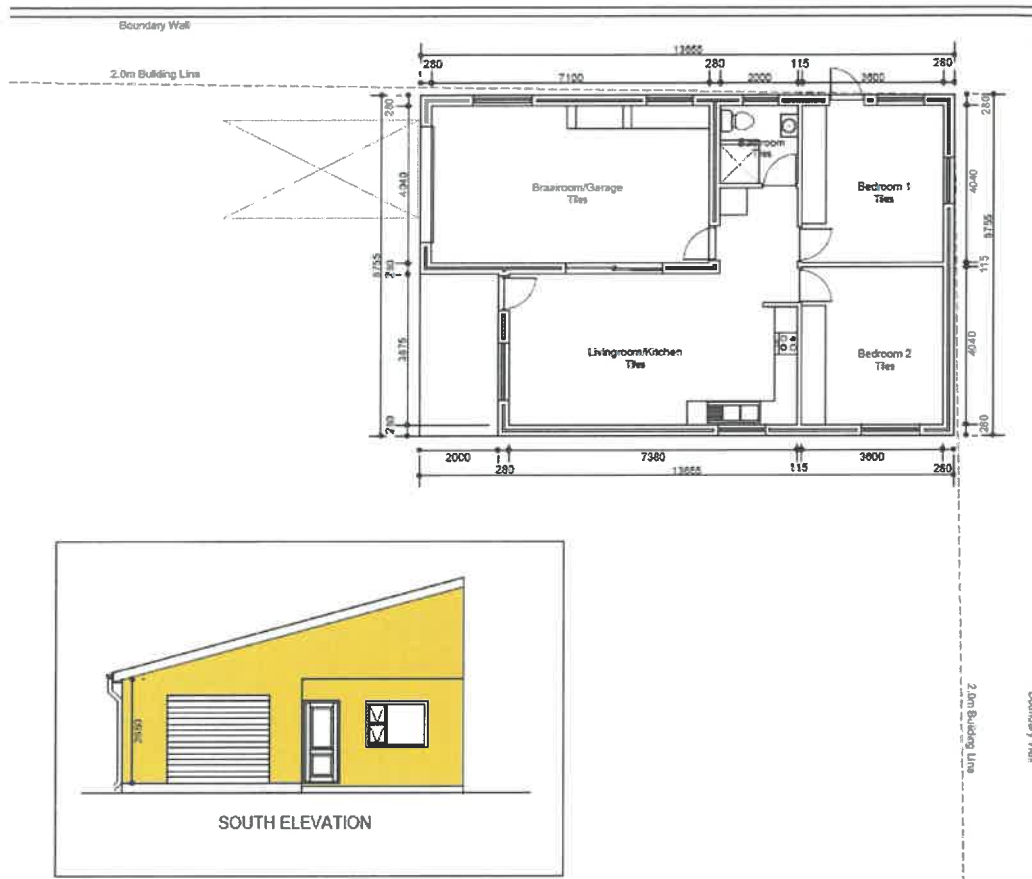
Floor layout plan and south elevation of the proposed second dwelling unit
